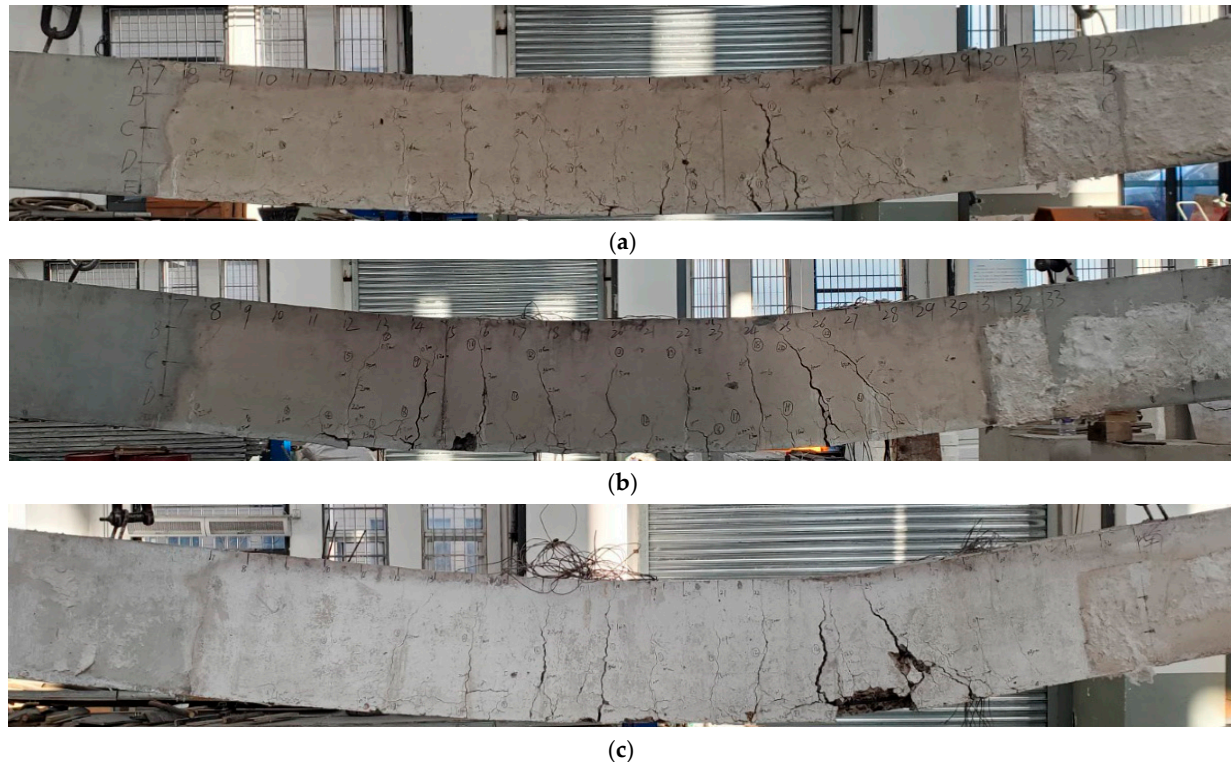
Failure modes of SSB under fire: (a) SSB-1; (b) SSB-2; (c) SSB-3.
